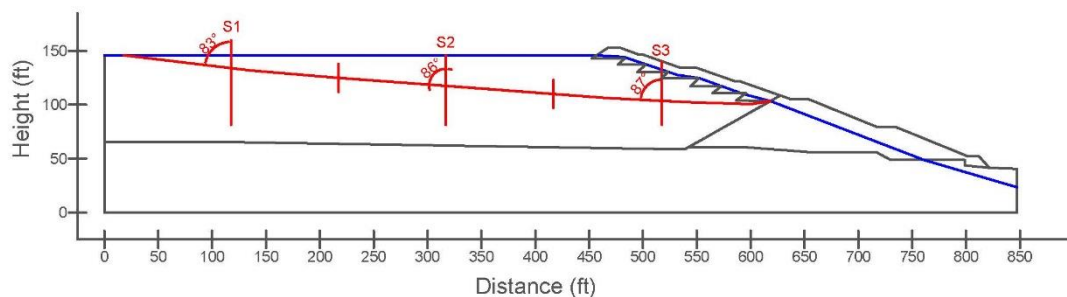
Sub-sectioning of the cross-section and failure plane for Mochi-Koshi Tailings Dam 1
